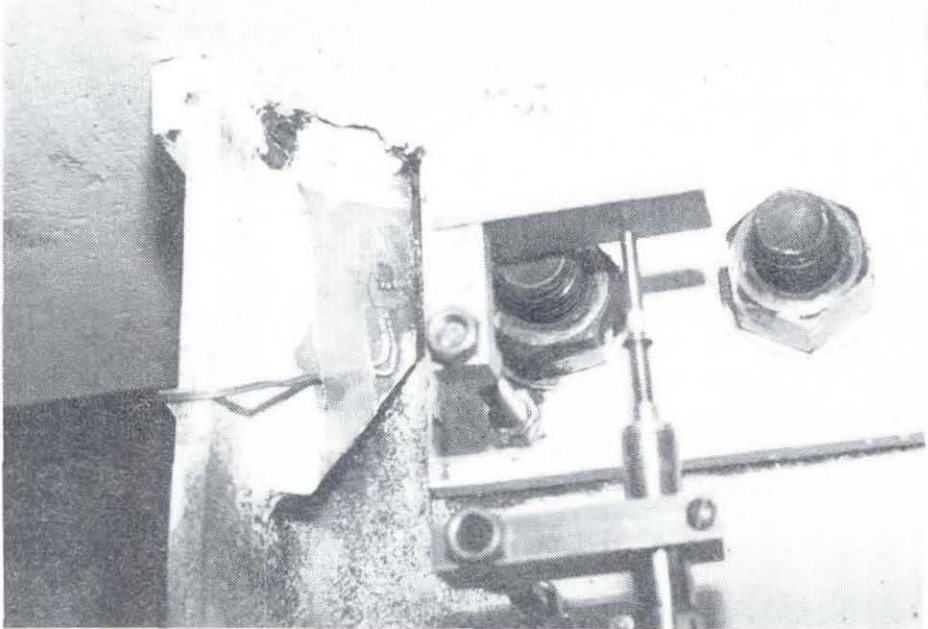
Cracking of Welds and Slippage of Bolts (Specimen 7)
